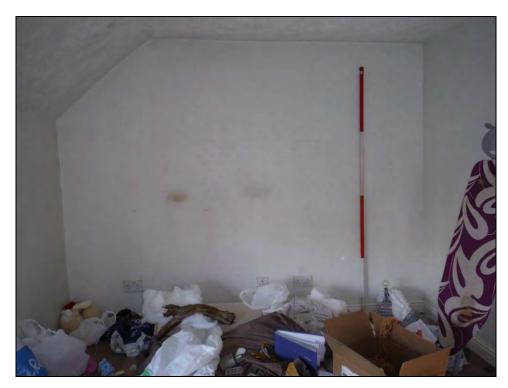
South-east wall of Room F4 (scale = $1 \times 2m$).
